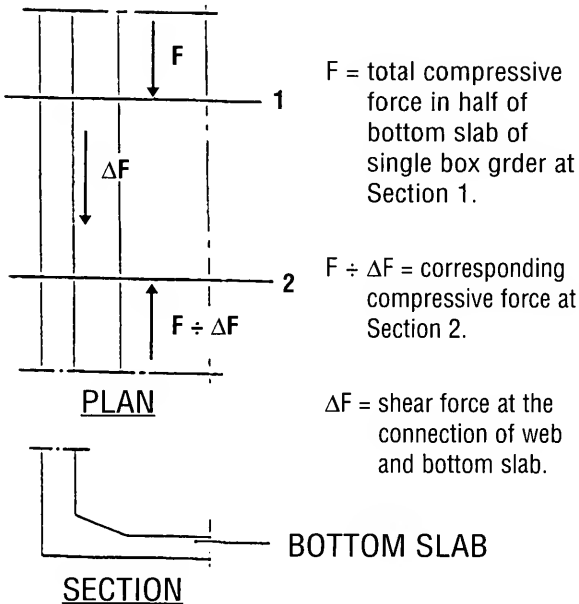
D. Longitudinal shear transfer by bottom slab to web haunches.\
